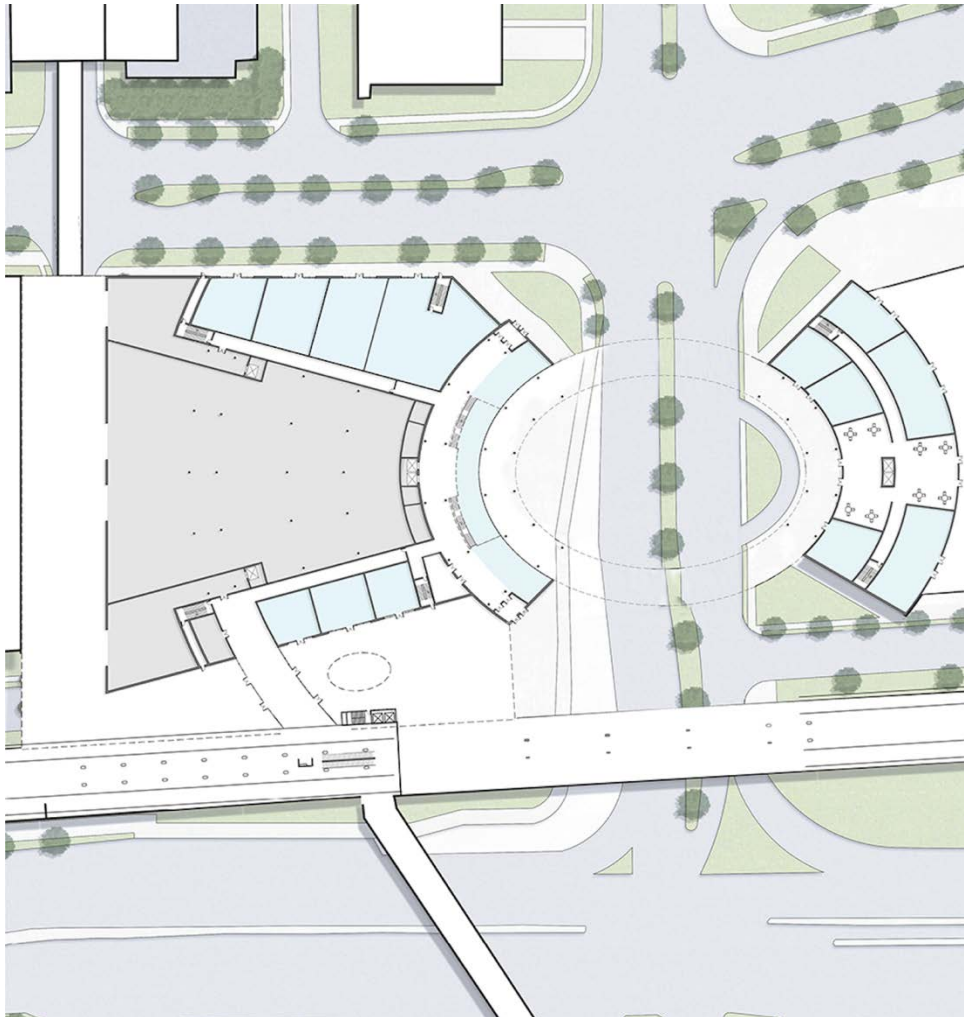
First Floor Plan – Street Level (Source: Jefferson Choi)
